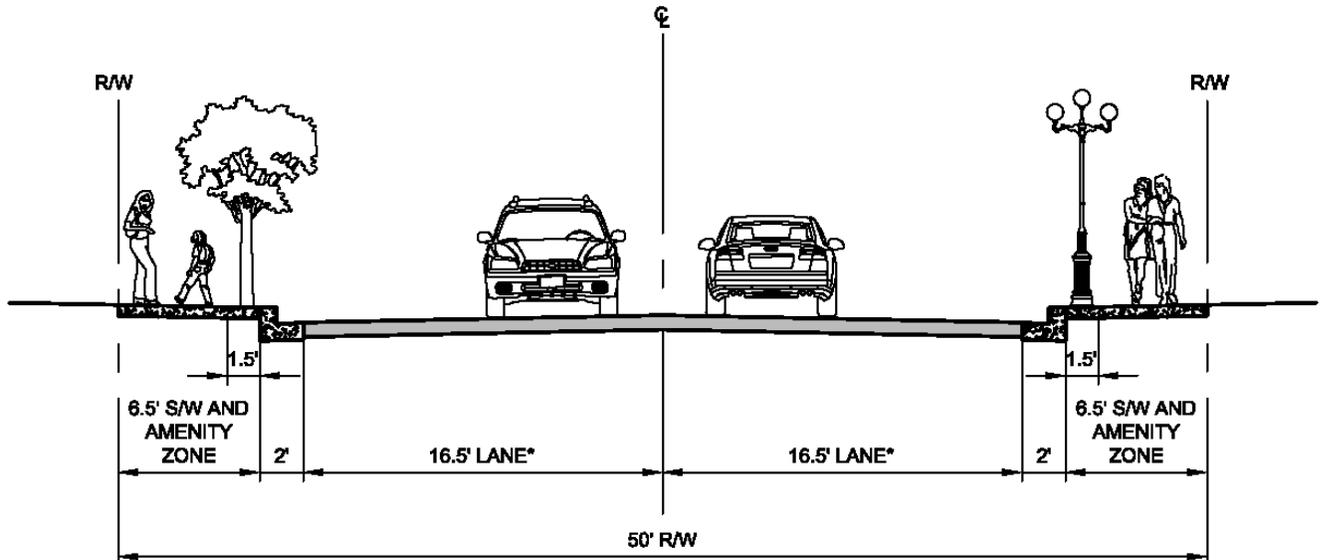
50-Foot Right-of-Way Option B: On-Street Parking
